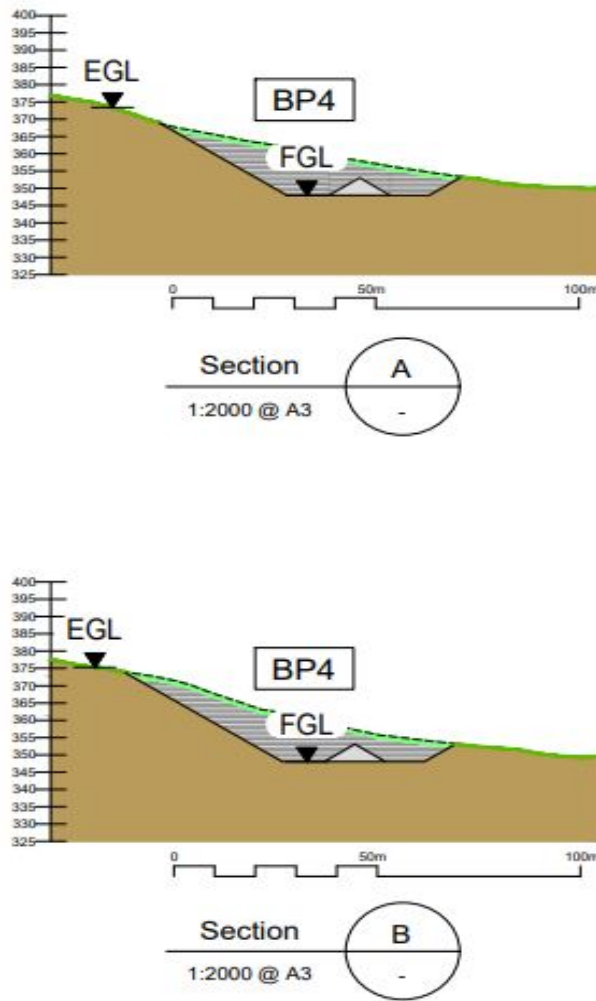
Sections through Borrow Pit BP4 at Shios Dam
